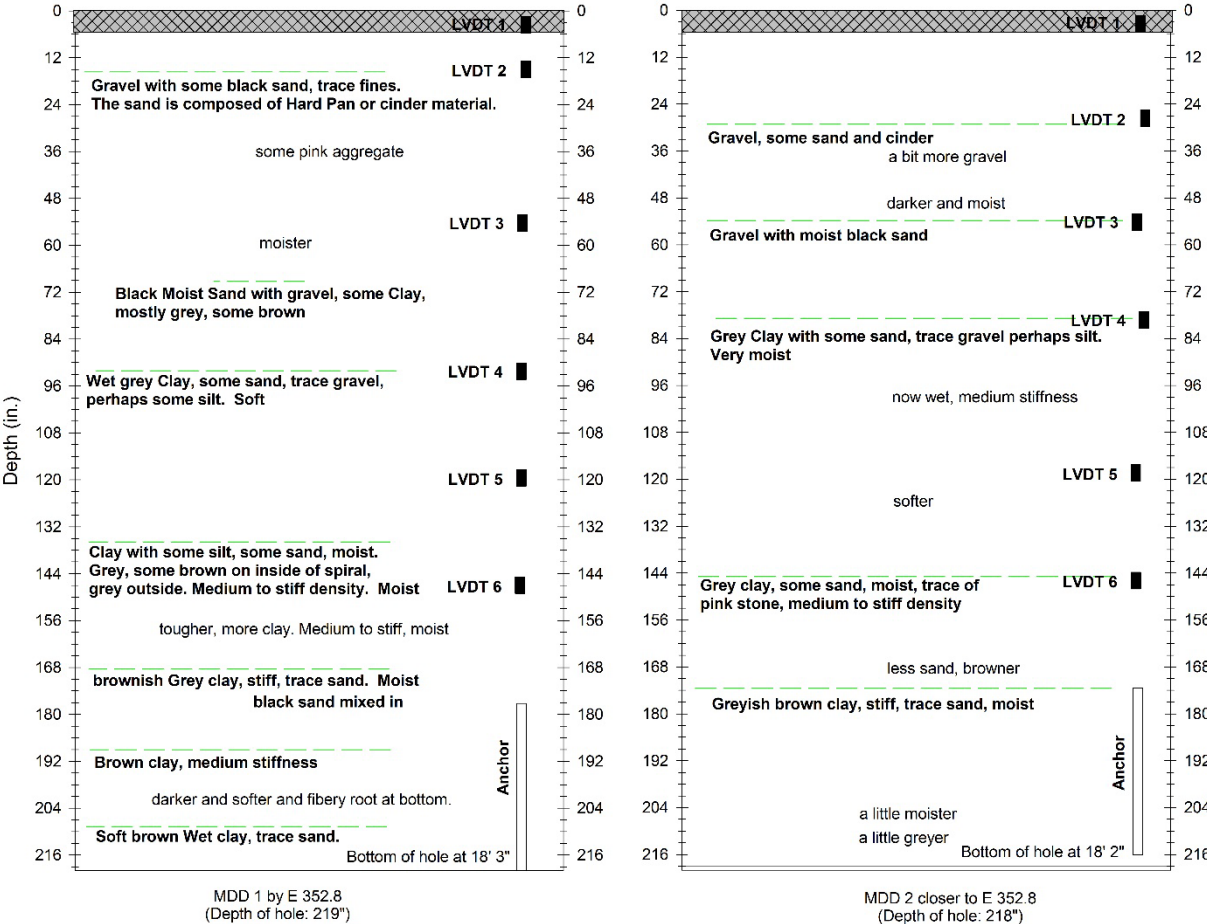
Track Substructure Layer Profile at Bridge MP352.8 East Approach
